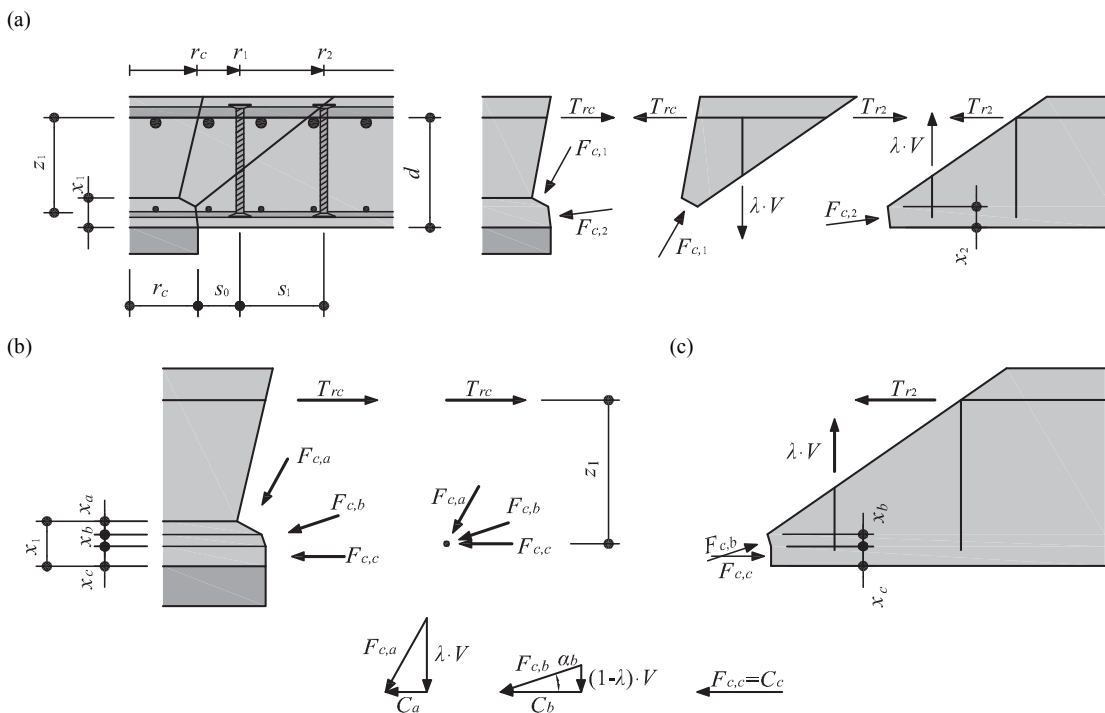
Forces acting at each slab element: (a) overview; (b) detailed view of forces acting at the column face; (c) detailed view of forces acting at the intersection plane at  $r_2$
